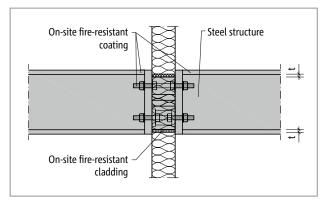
Fire protection Schöck Isokorb® T type S: On-site fire protection cladding T type S, fire protection coated steel structure; section
